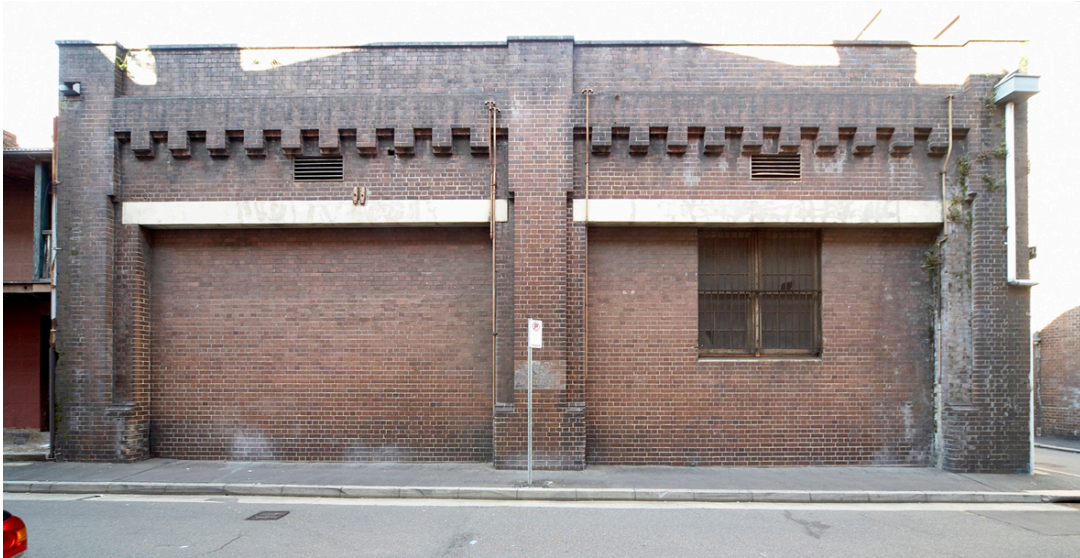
Kensington Street elevation. The top of the parapet is level. (the decorative effect on the parapet is a cast shadow from the brewery building opposite (now demolished). The parapet line to Kensington Street is horizontal).
